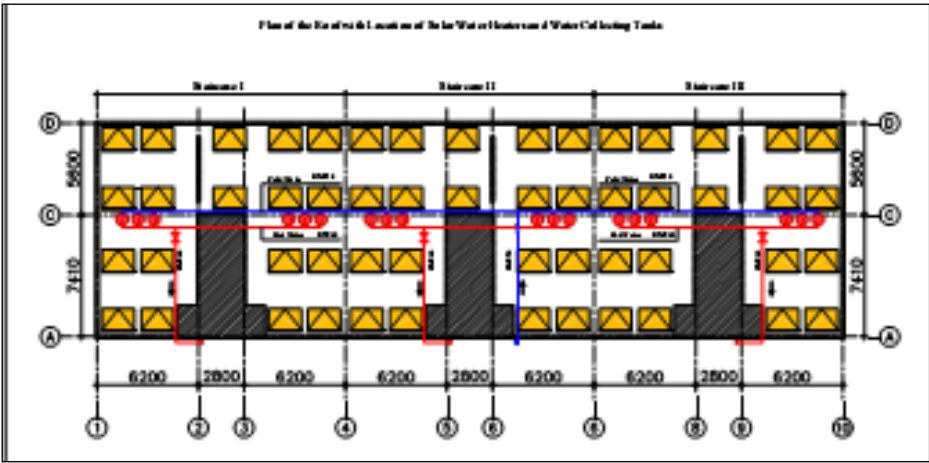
Scheme of installation of solar collectors on the roof of #1/IV VazhaPshavela Ave.
